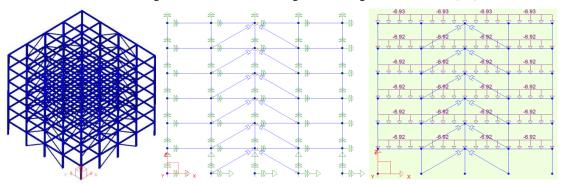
Three-dimensional model of the steel building, Nodal Restraint Conditions, and Uniformly distributed gravity loading on the beam for the 2D model (from left to right)
